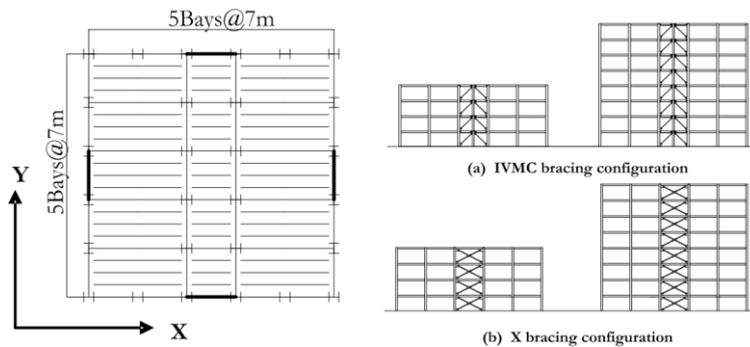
Plan view and elevation of CBF structures with (a) IVMC (b) X bracing configuration
